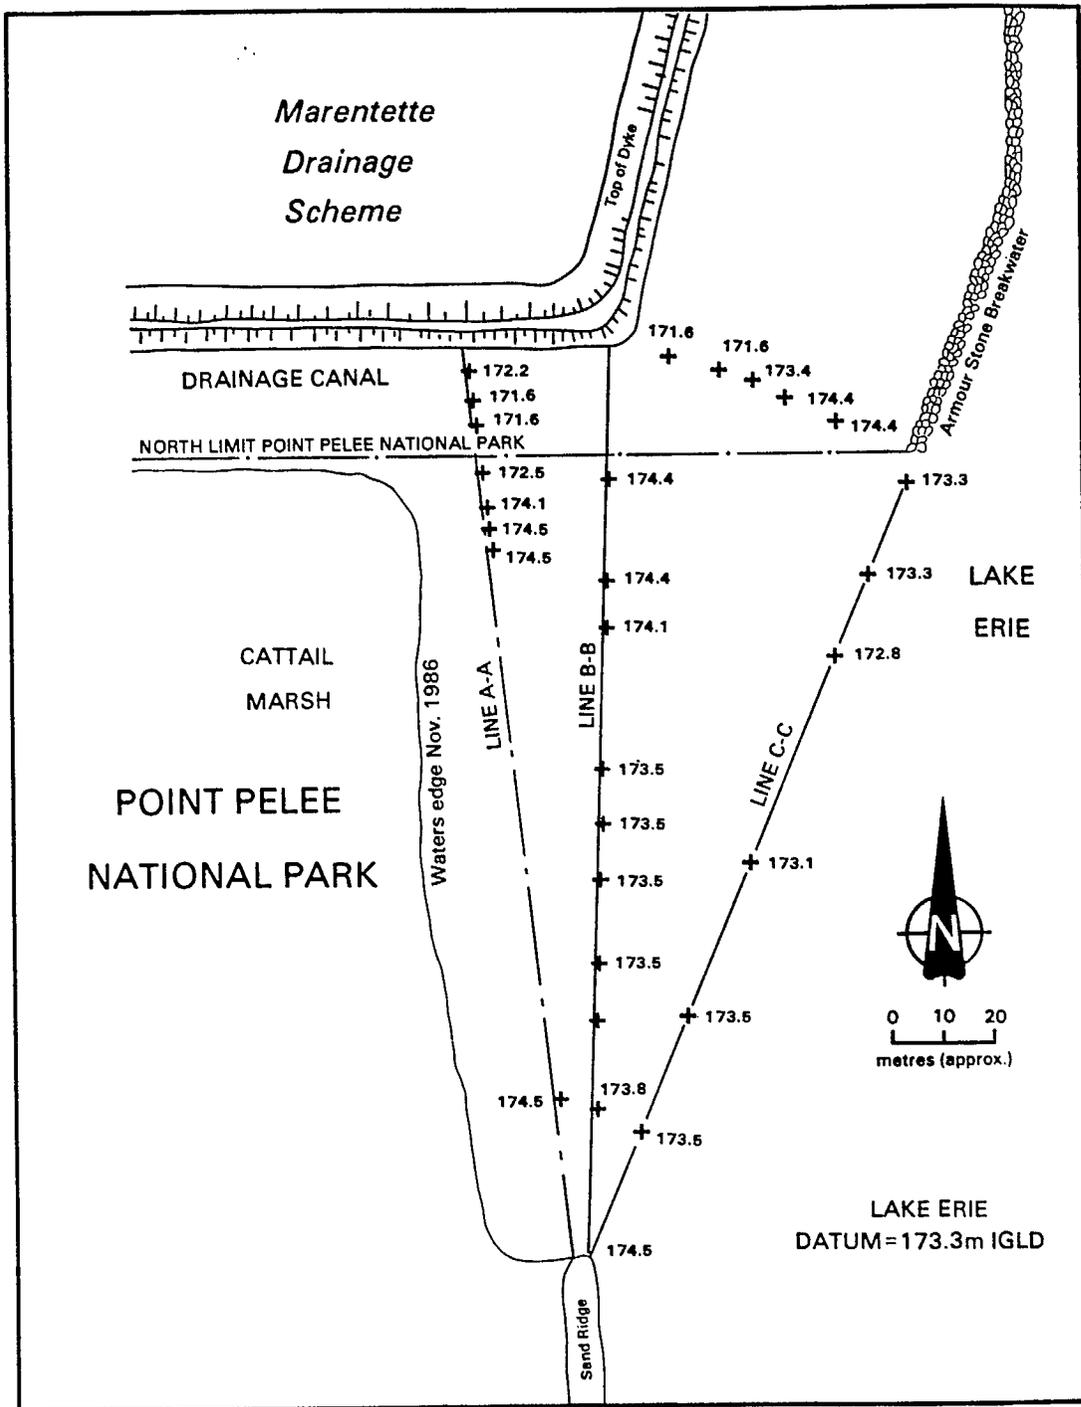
Bottom Elevations and Site Plan From Settingington Survey of December 1986
